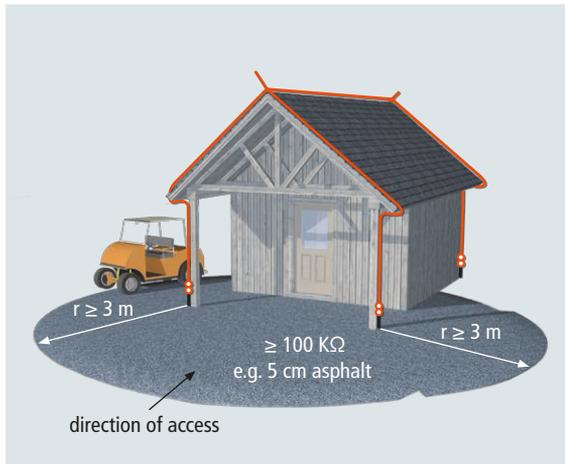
Protection of a shelter with one entrance and defined direction of access against step and touch voltage
